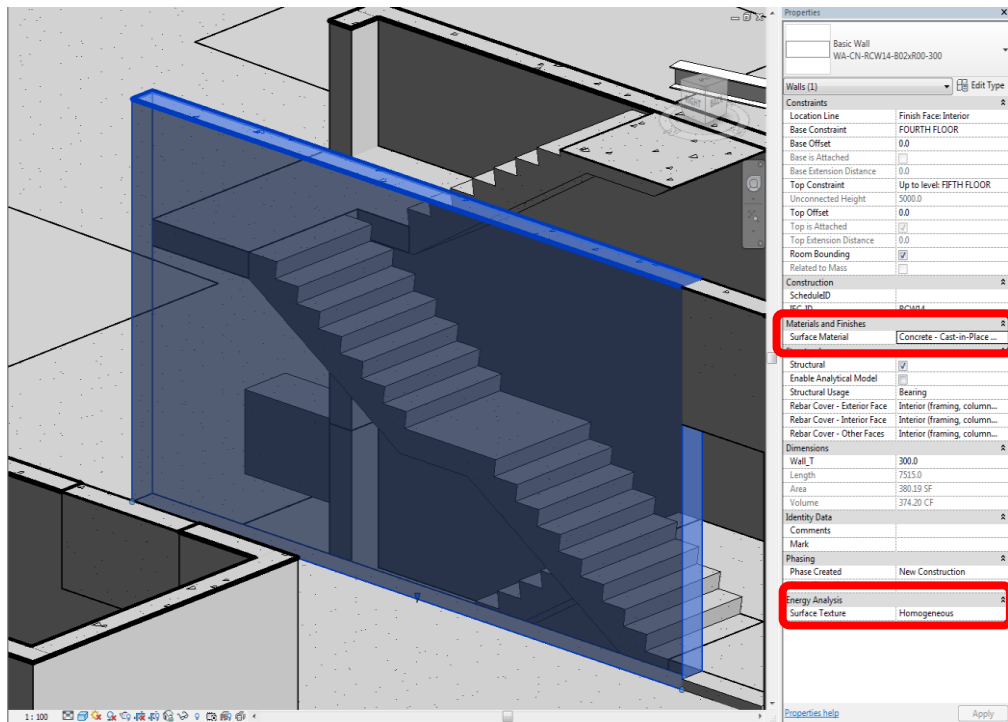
The updated BIM model showing concrete surface material and homogeneous texture of the interior walls.
